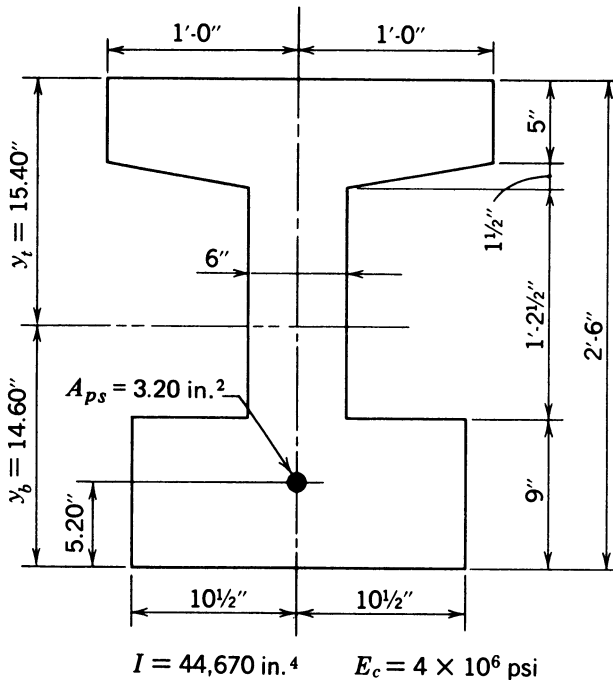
Cross section of beam used in I.P. 5-8.
